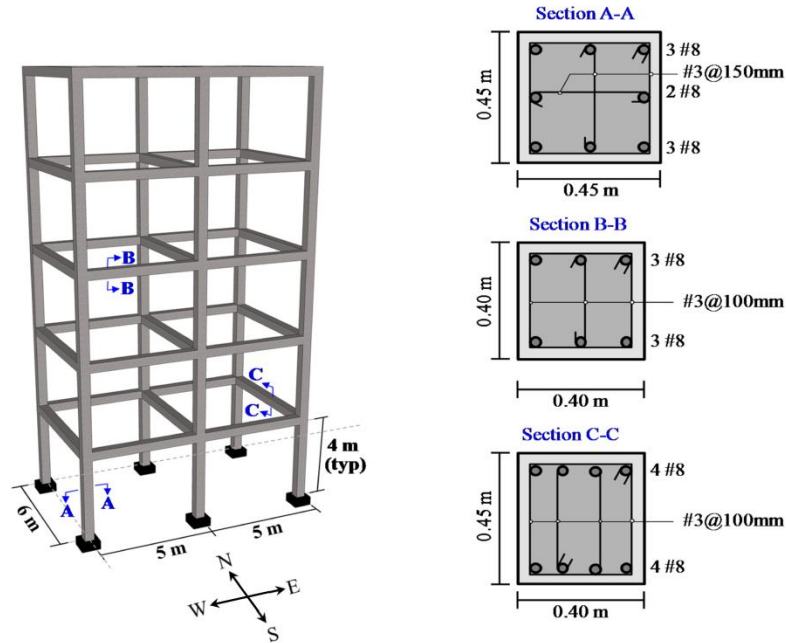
RC frame building structure: isometric view and cross-section of beams and columns.
